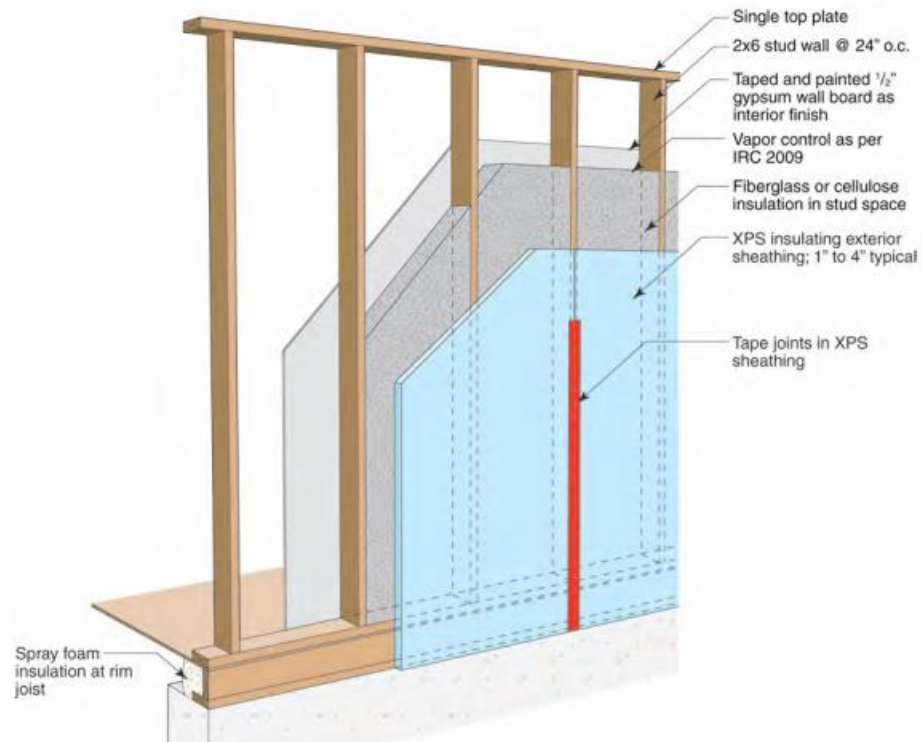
Insulated sheathing wall system (Straube and Smegal, 2009)
